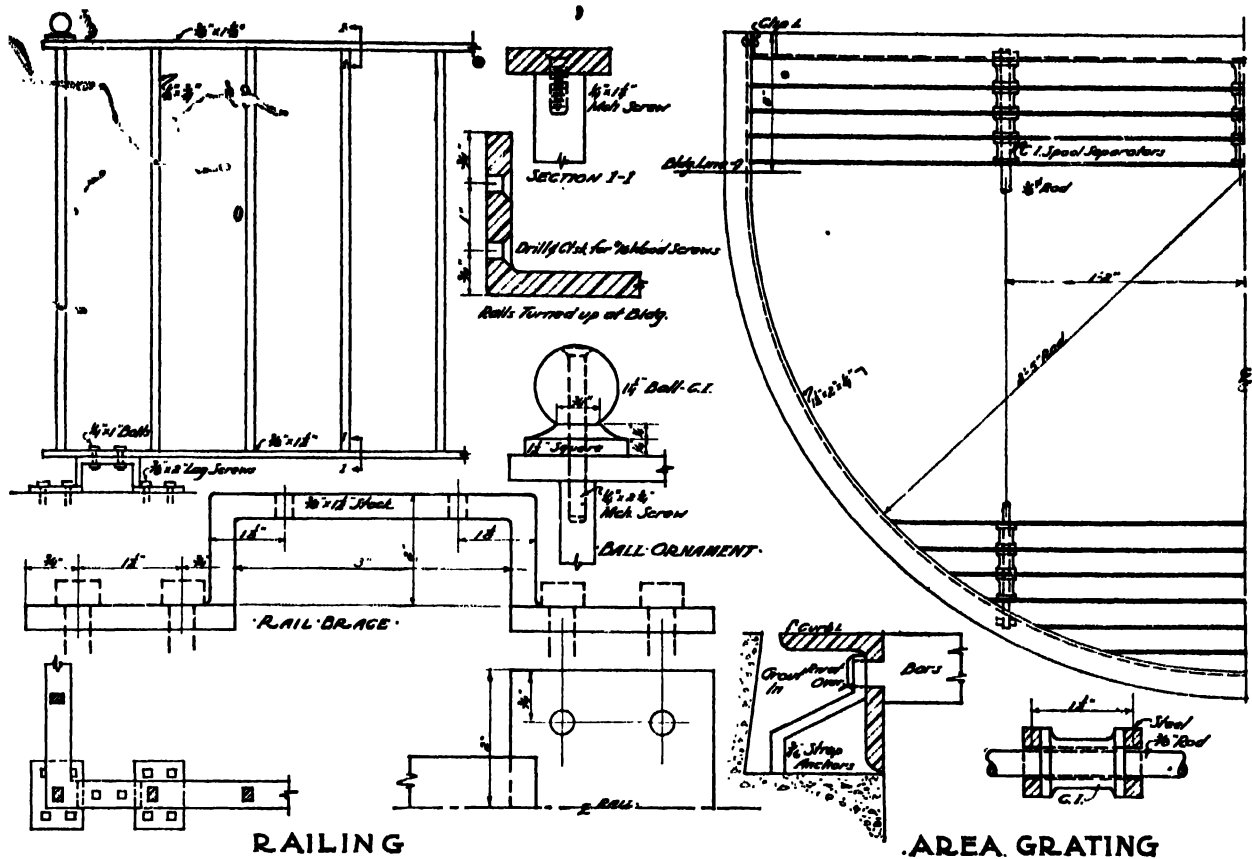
DETAILS OF RAILS AND WROUGHT IRON GRATING
